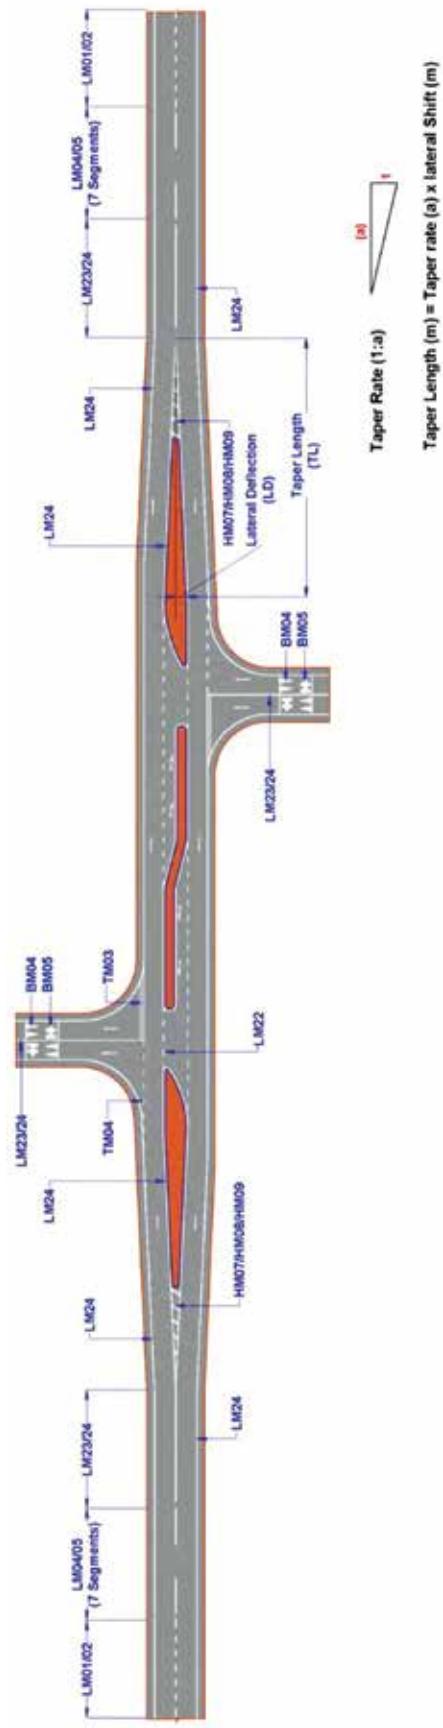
Layout for Staggered Intersection (With Right Turn Protected Arrangement)
